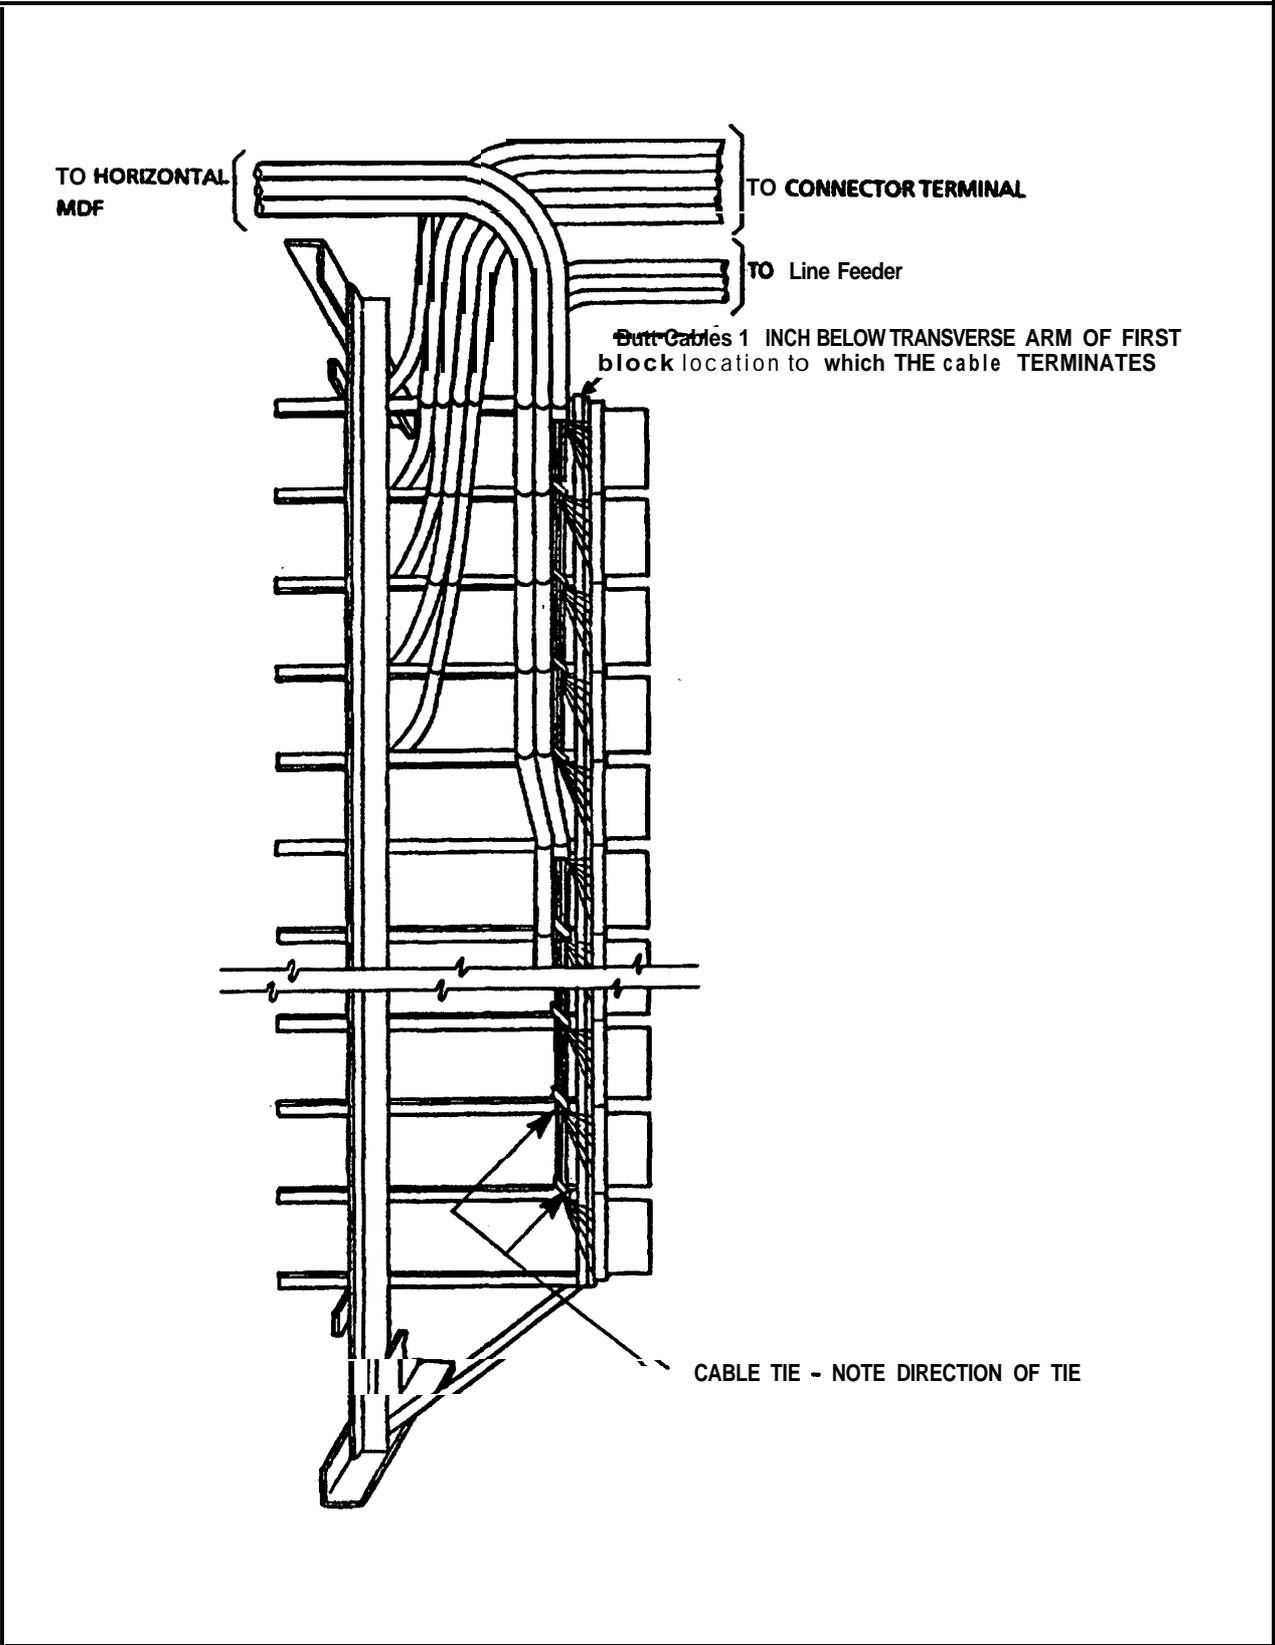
Cable Tie Arrangement and Cabling on Vertical Line IDF
